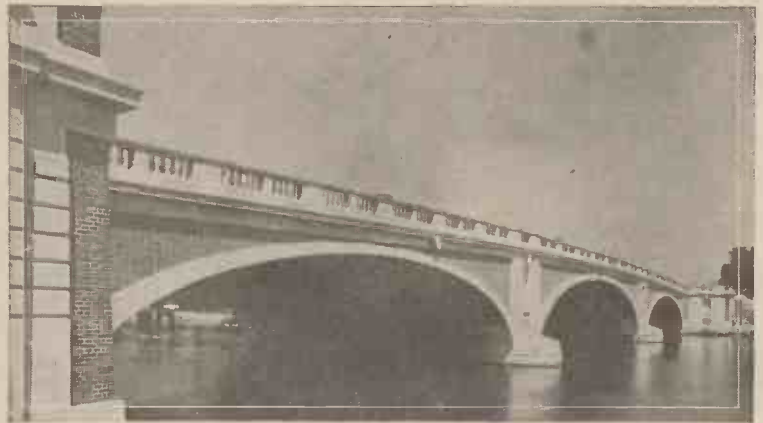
Hampton Court Bridge—another fine example of a reinforced concrete arch bridge with brick and stone dressings.
